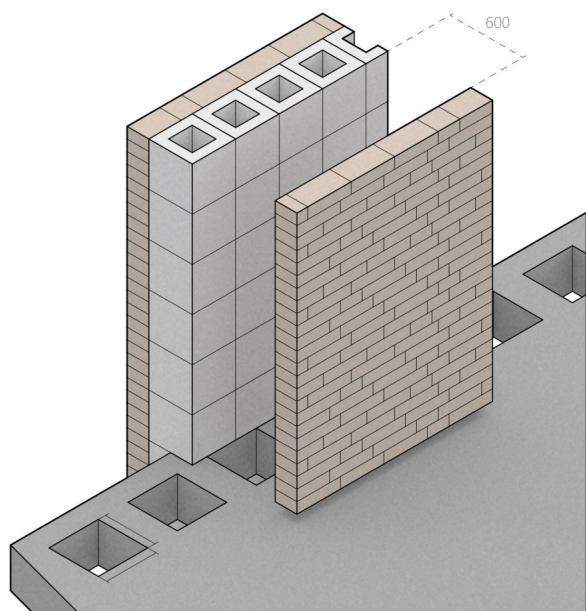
Construction for load-bearing wall and in-between gap for installations for ventilation
